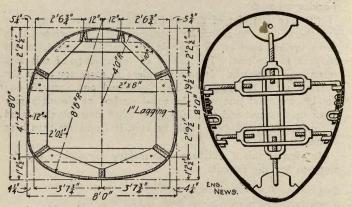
Center for 8-Ft. Conduit, Pittsburg Filtration System.
